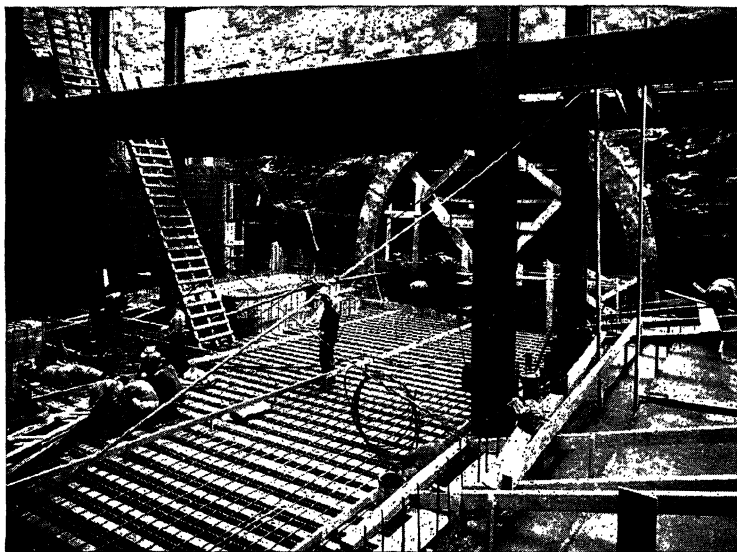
A.—Construction of the roadway slab of the Lincoln Tunnel at the New Jersey shaft.
